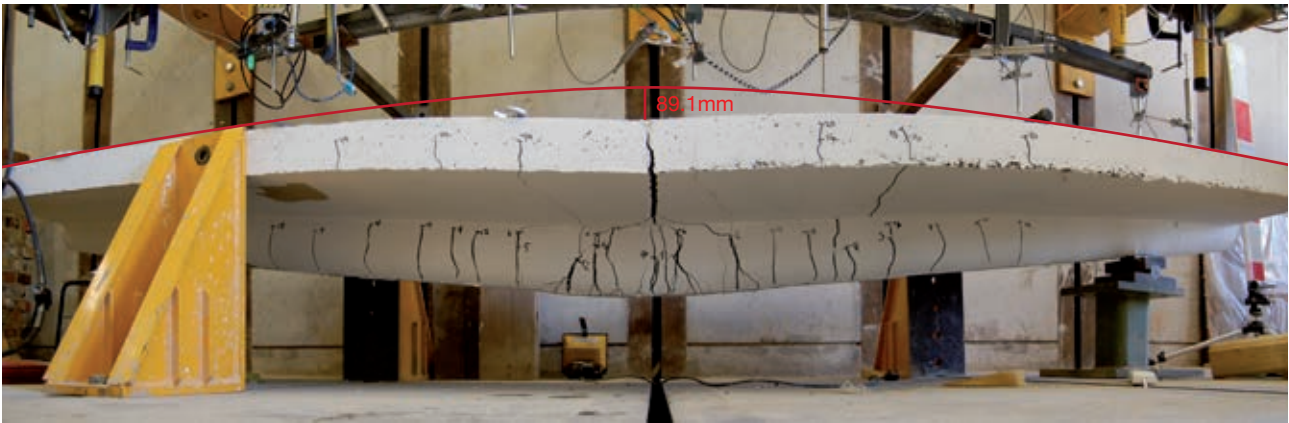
Beam 5\_3\_H\_F test photographs and crack distribution at failure.
